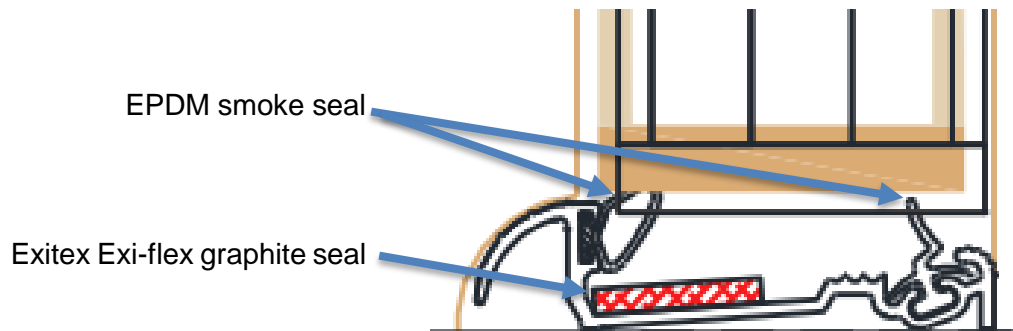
Drawing of the tested threshold design extracted from test report WF523412/R Issue 2
